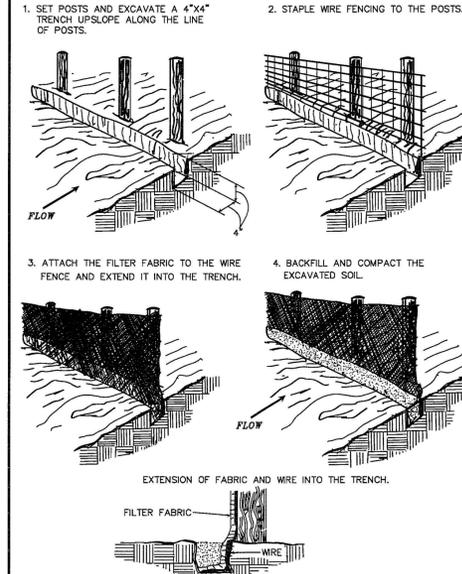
SOURCE: CONVED PLASTICS VDOT ROAD AND BRIDGE STANDARDS VA, DSWC
